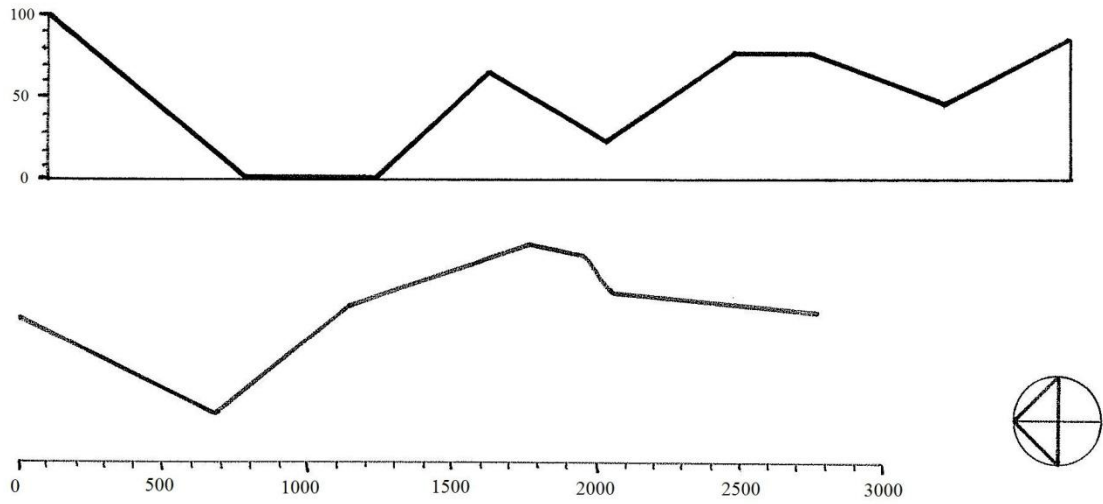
Evolved Elevation and Plan Pipeline Alatri (Flow Direction Left to Right)
